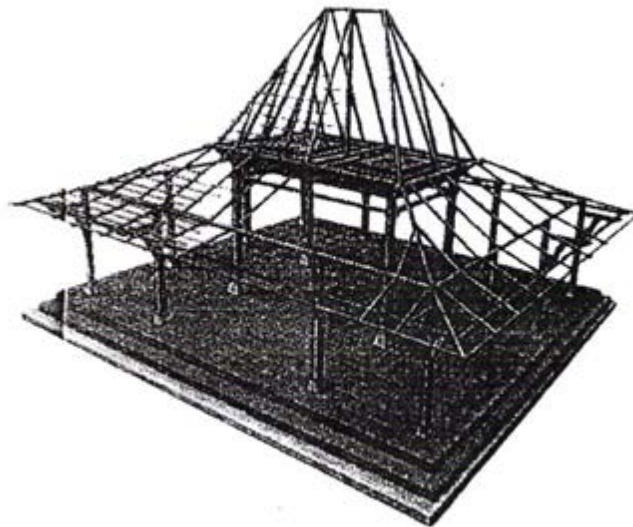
, Saka guru umpak in the center of the building, saka rawa umpak at the edge (source image: Prihatmani, JP)
